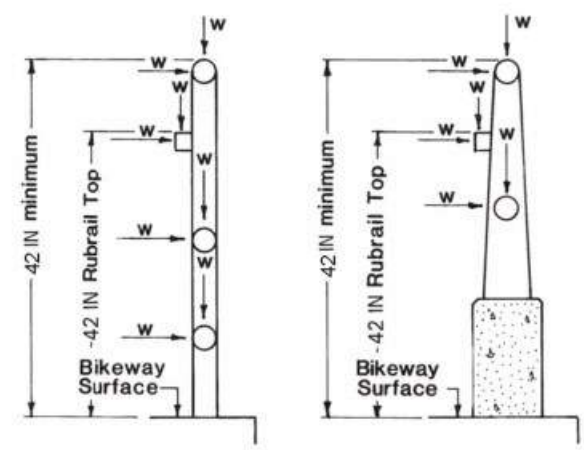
Bicycle Railing Loads—To be used on the outer edge of a bikeway when highway traffic is separated from bicycle traffic by a traffic railing. Railing shape illustrative only.
